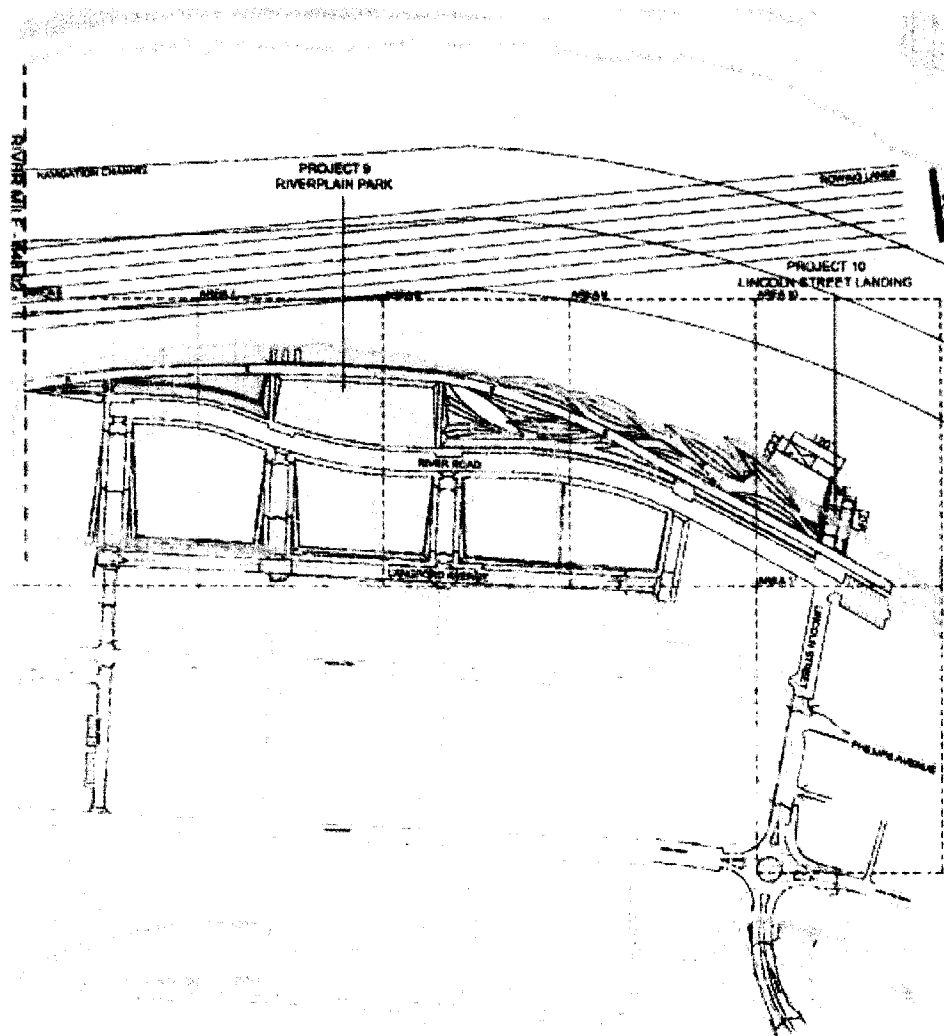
Schematic Design, Middle Section Area 6-11, Scale 1"=250' (Hargreaves Associates, 2008).
